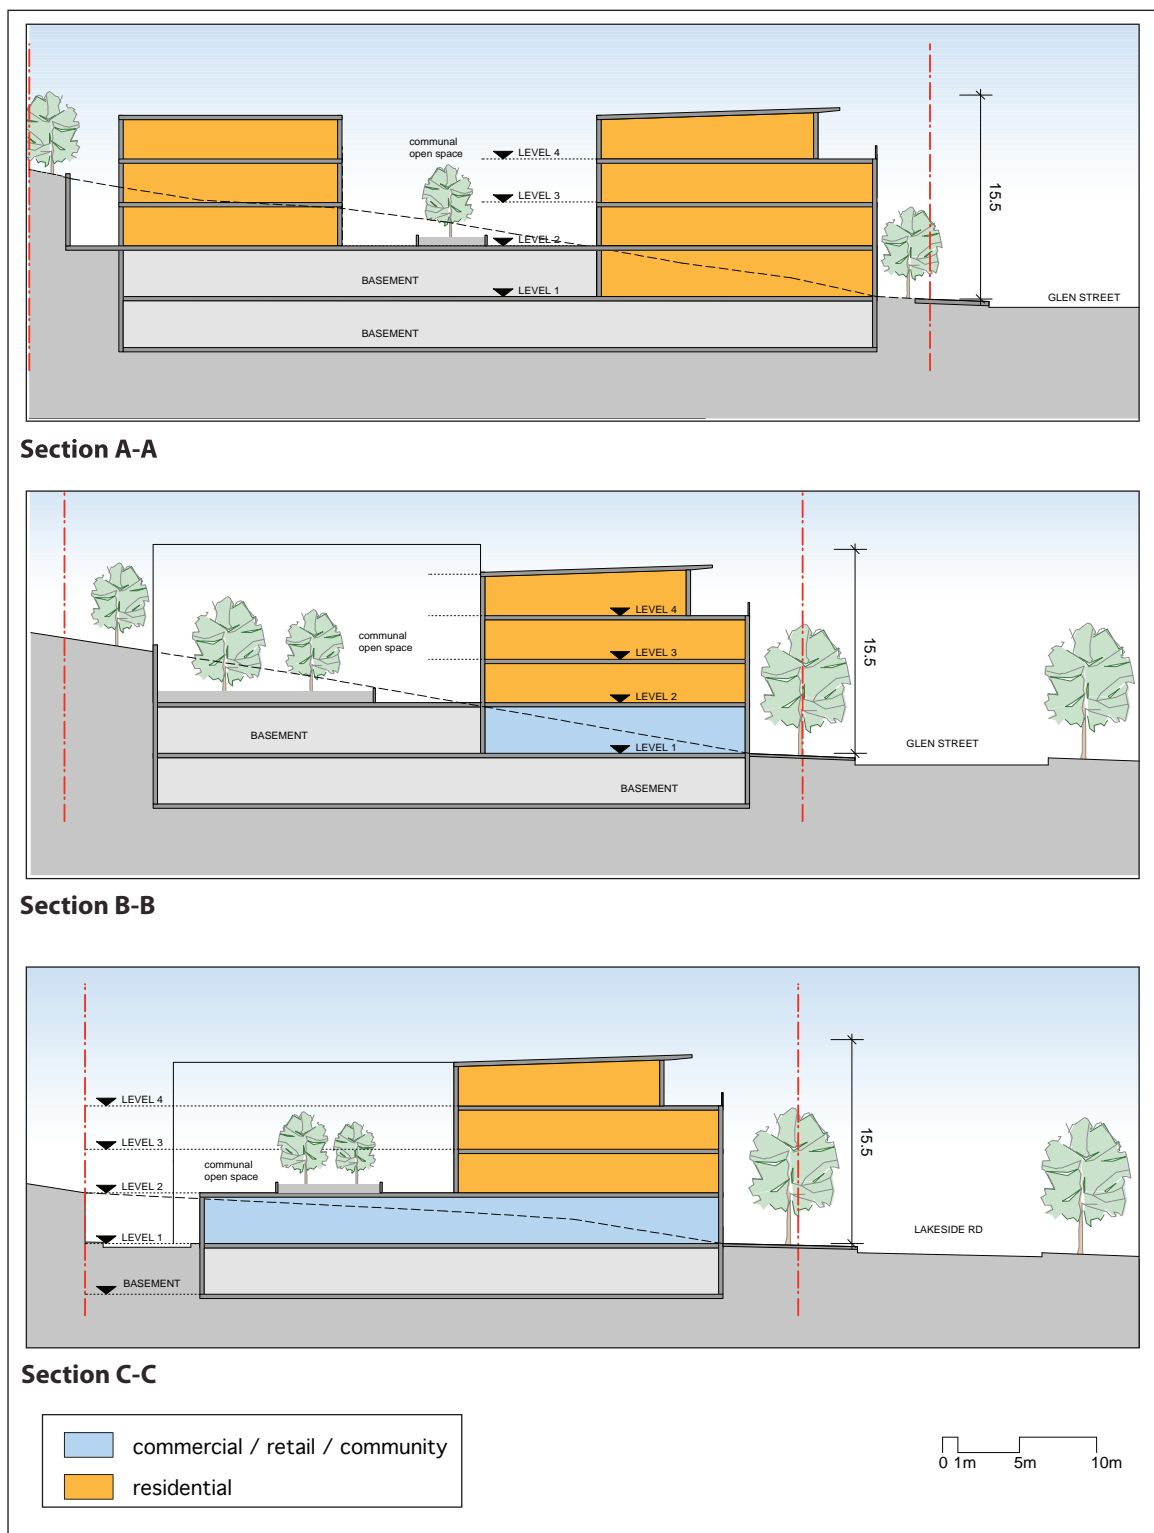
Glen Street and Lakeside Road Small Centre Building Height Control Sections.
